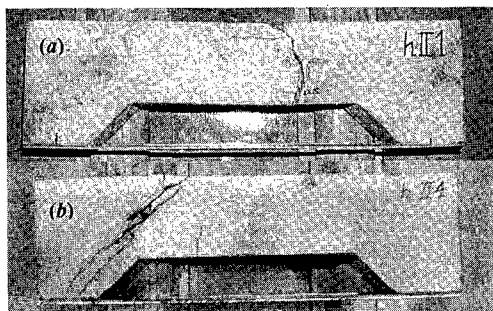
Failure mode of (a) specimen h-1 and (b) specimen h-4
